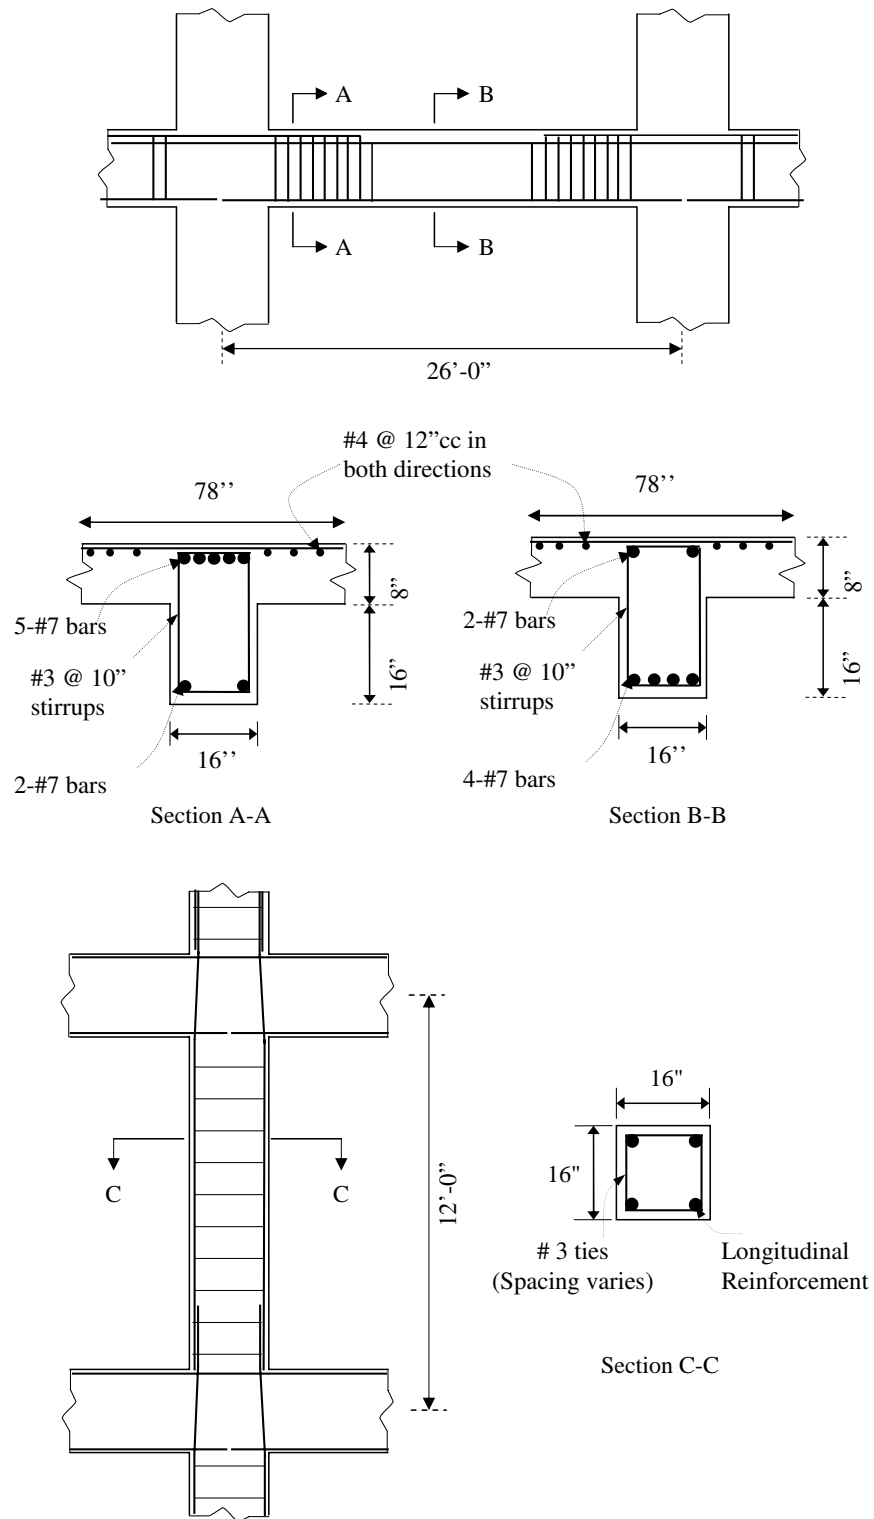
Design details of example buildings (Ramamoorthy et al. 2006)
